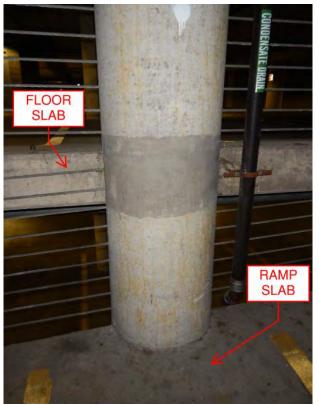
Column along Gridline 3.5 and 9.5 where floor slab and ramp slab intersect with column at different elevations.
